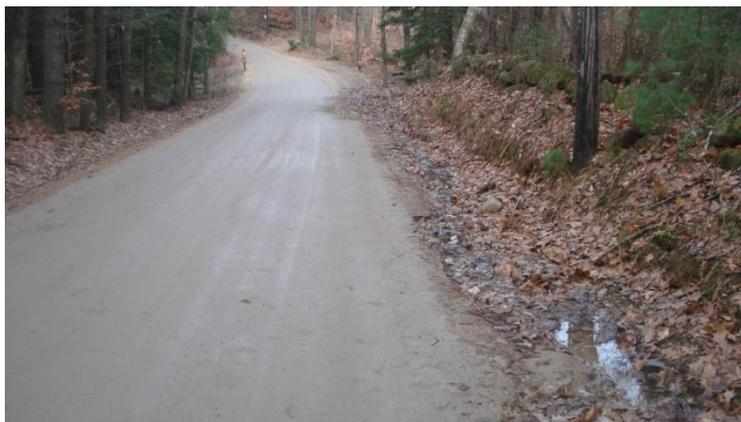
Kaulback Road, Looking North Toward Black Brook – Swale Improvement (BMP 18)
